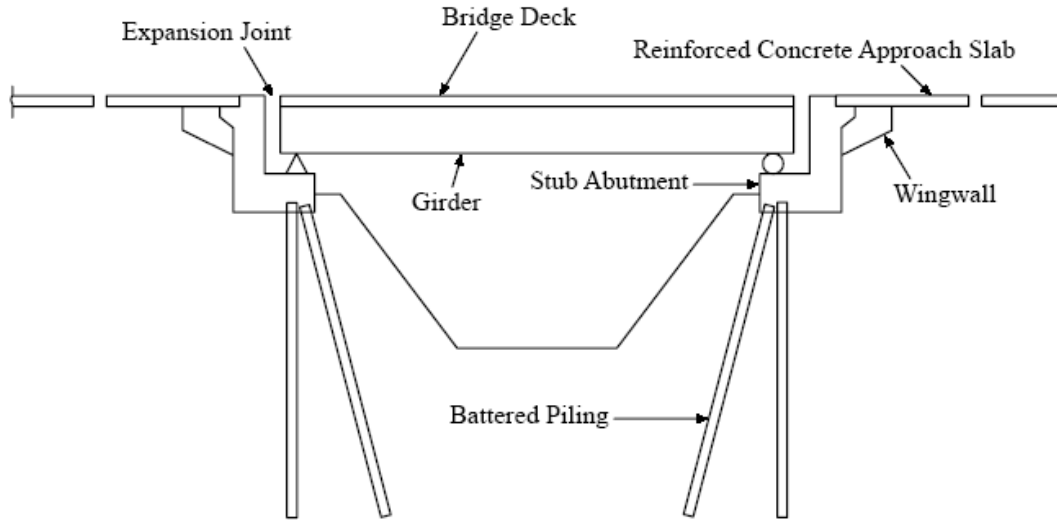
Conventional girder bridge (Greimann et al. 1987)
